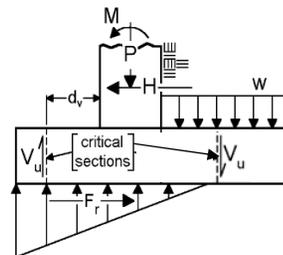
Example of Critical Section for Shear in Footings
